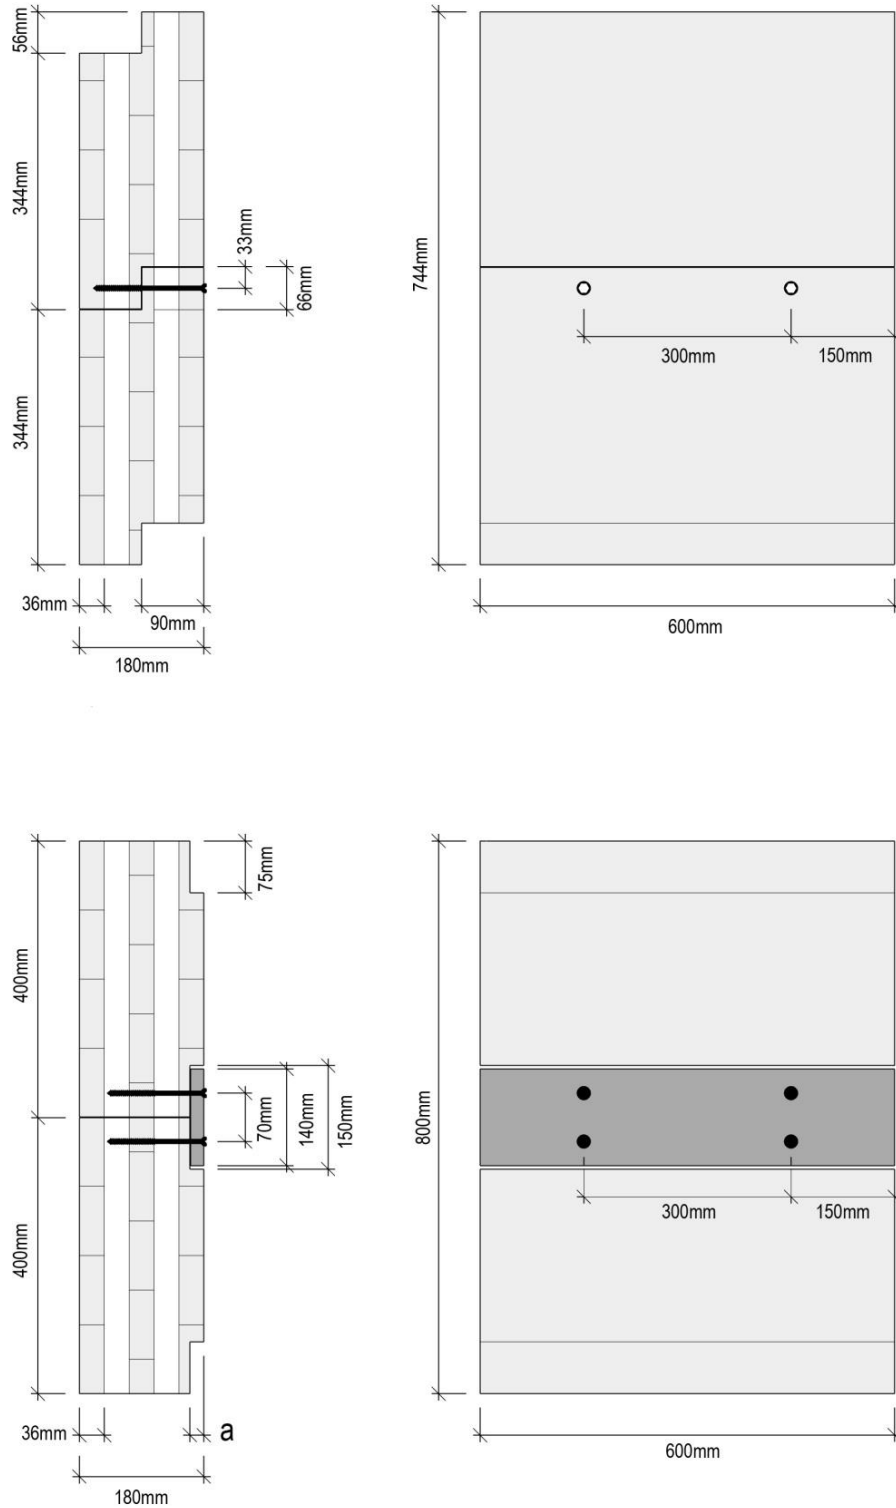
Specimen dimensions used in edge-to-edge connection tests: half-lapped connection (top) and single-spline connection (bottom).
